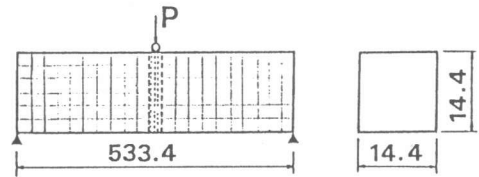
Simply supported centrally loaded plain concrete beam having center crack at the peak load.
